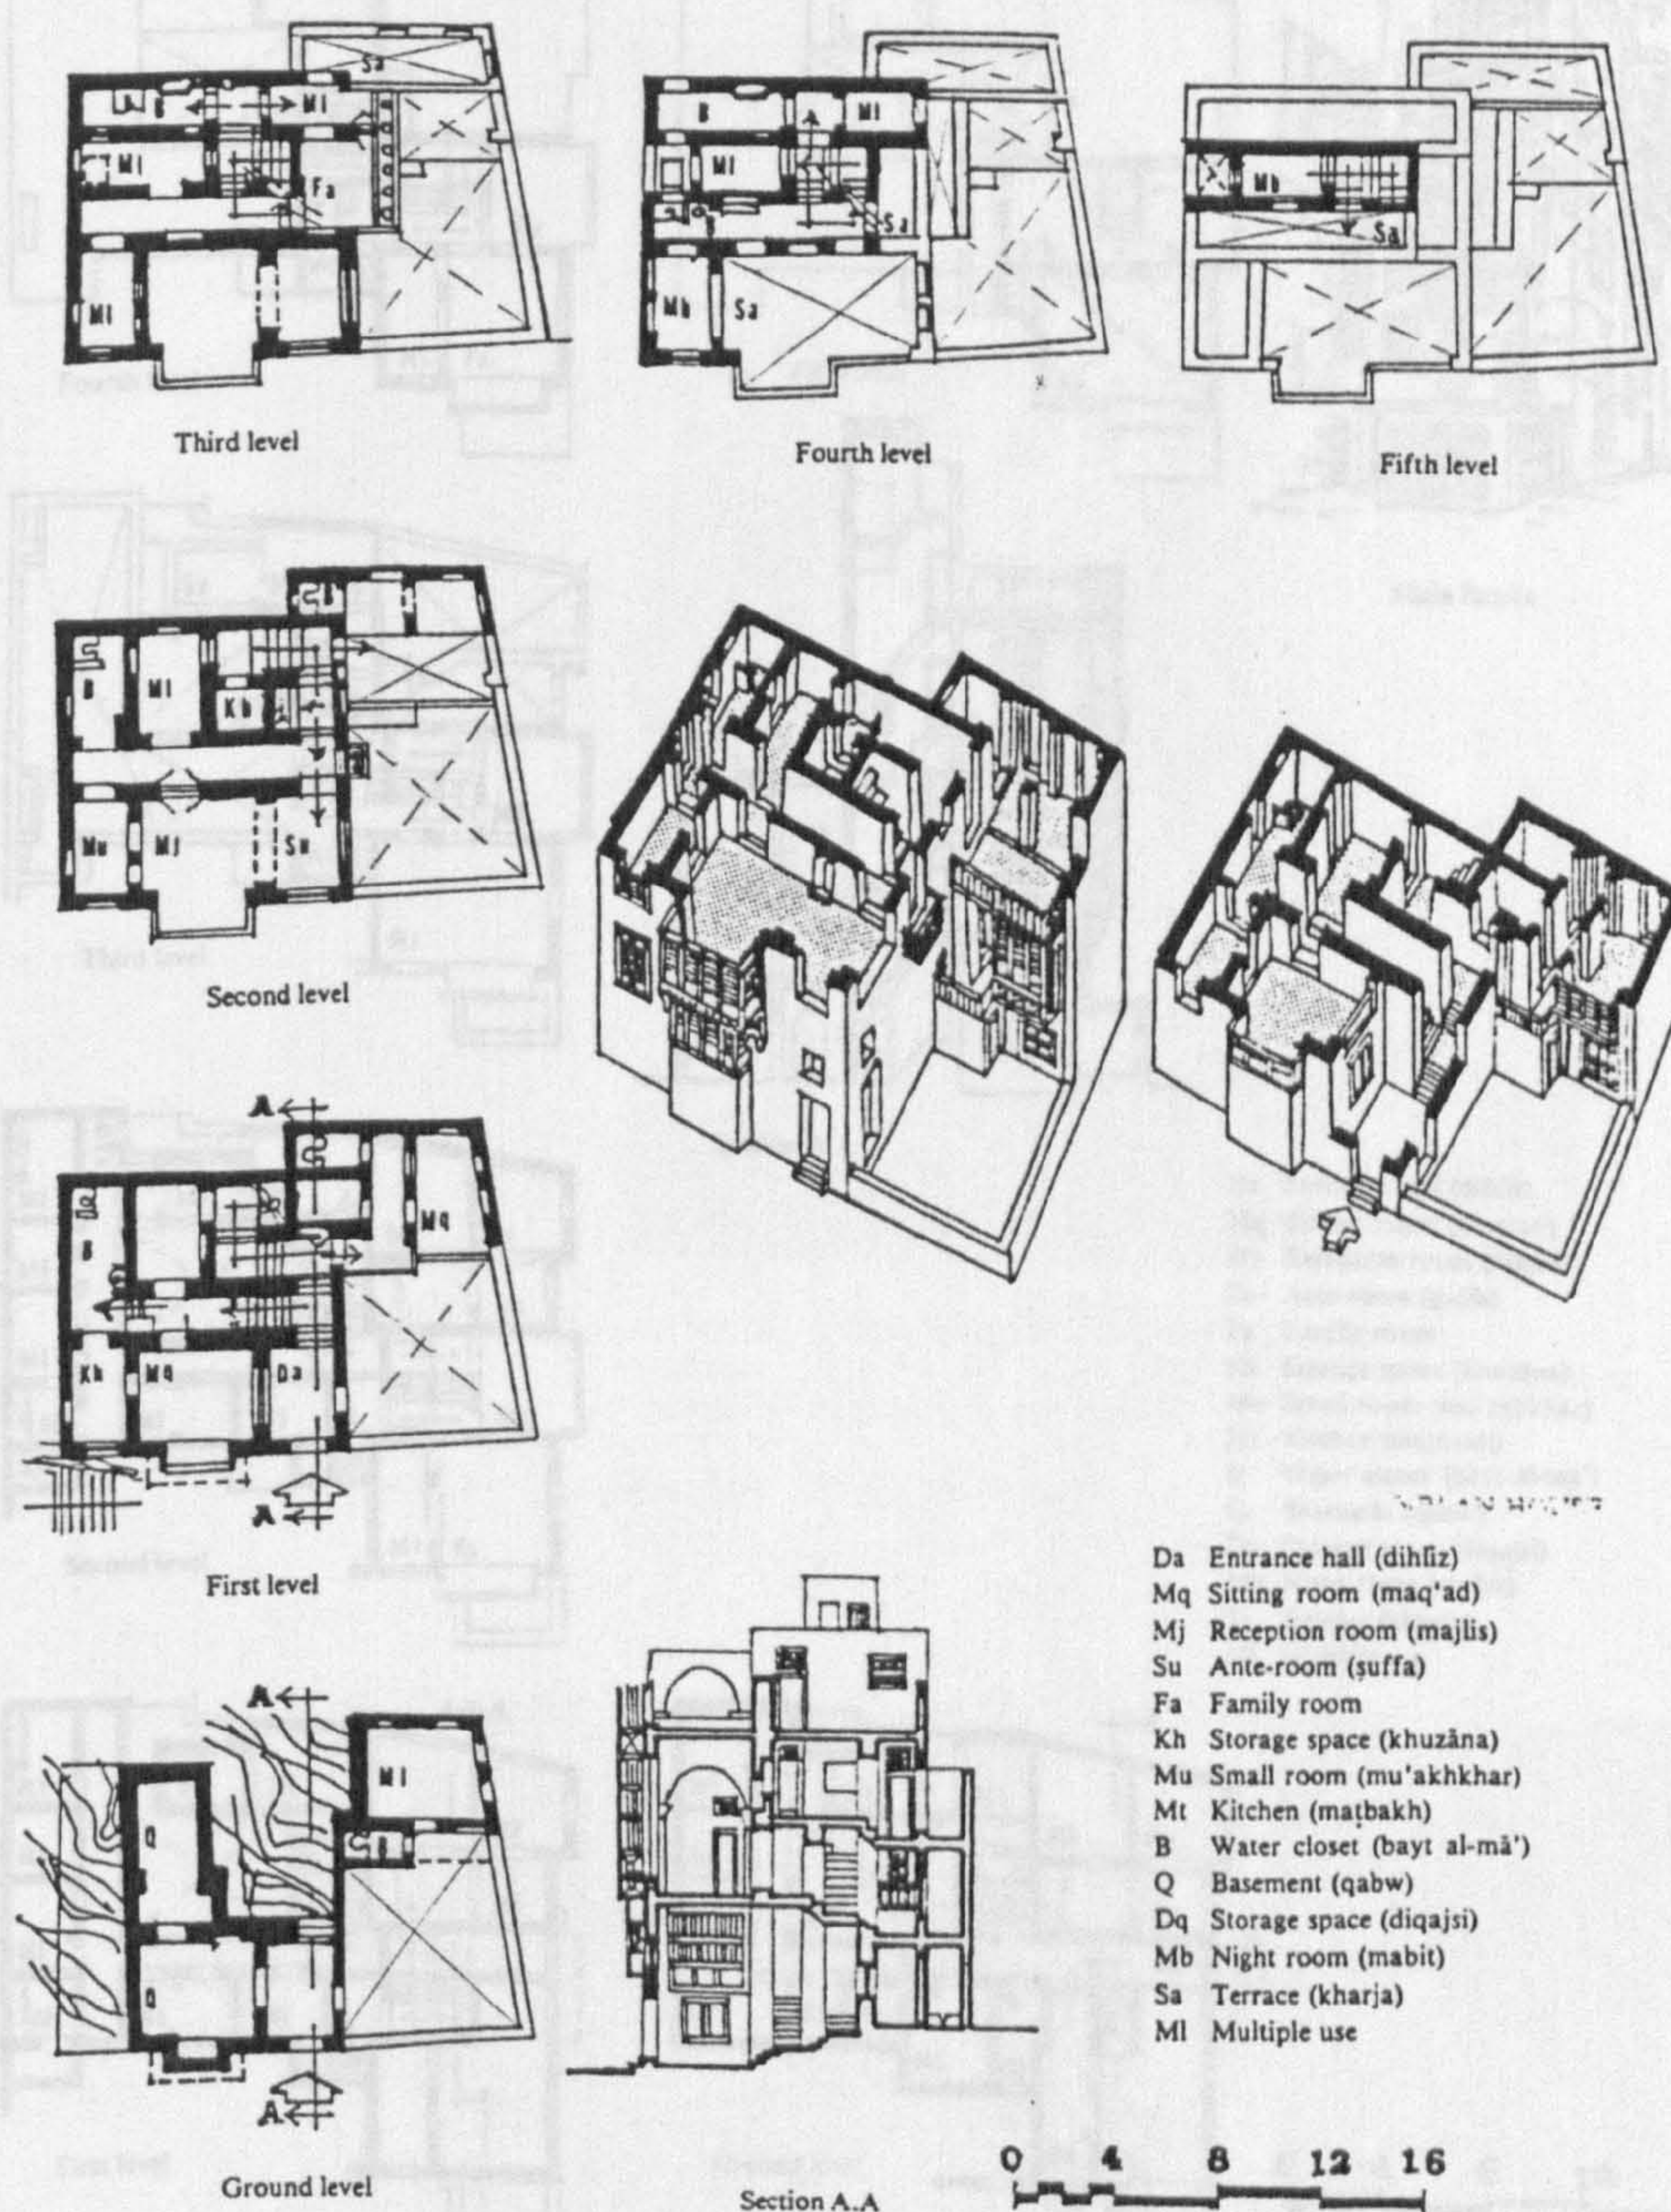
COMPOUND PLAN HOUSE, MAKKAH.
